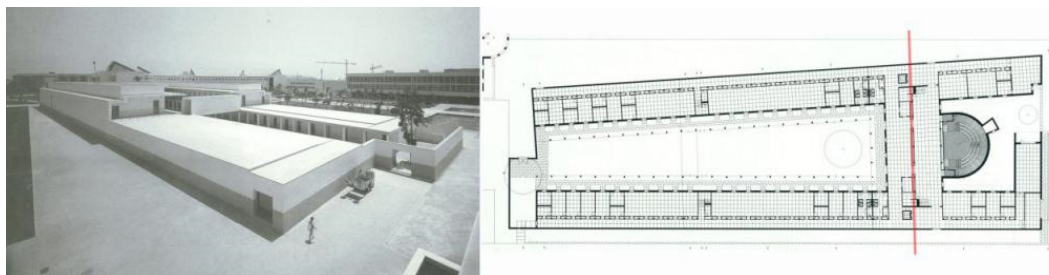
The facade closed to outside and ‘H type’ plan in Rectorate of the University of Alicante (1995-1998)
